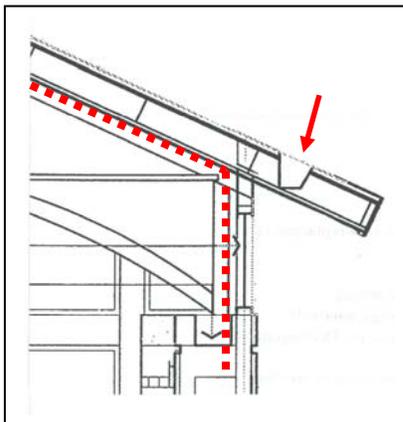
The Type A sloped roof overhang at top of wall poses difficulty (red highlights) in maintaining air and thermal barrier provisions. Roof drainage must also be suitably designed along the roof edge.
